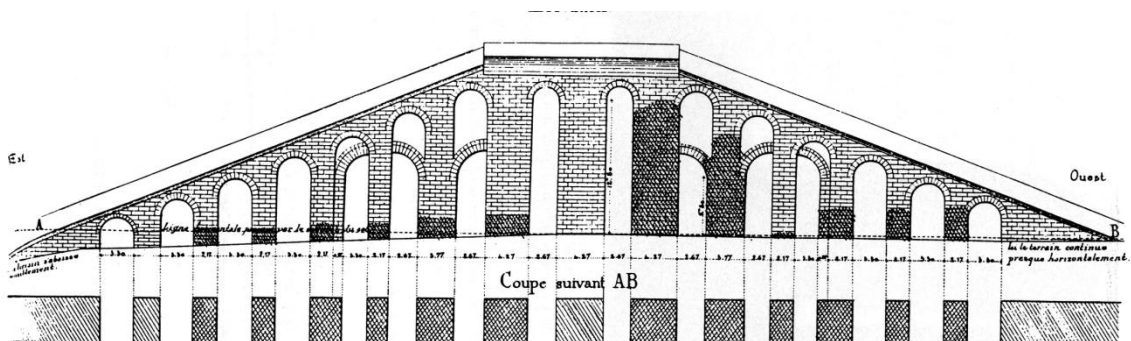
Reconstruction of the Tower (de Montauzan 1909)
